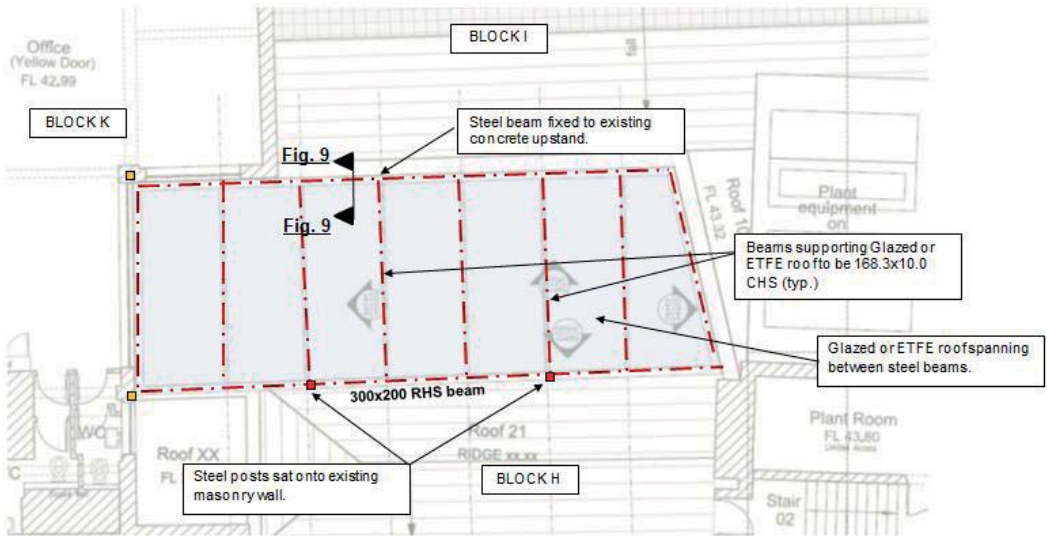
Extract of Sketch SK 007. Roof to internal courtyard – Option 2.
